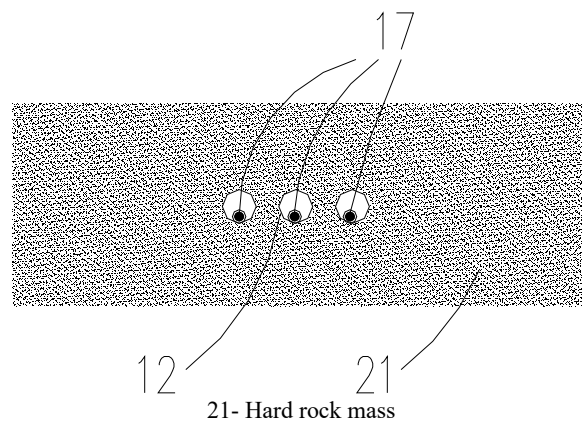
Laying and Protection Construction of Submarine Cable Landing Section in Hard Rock Layers
